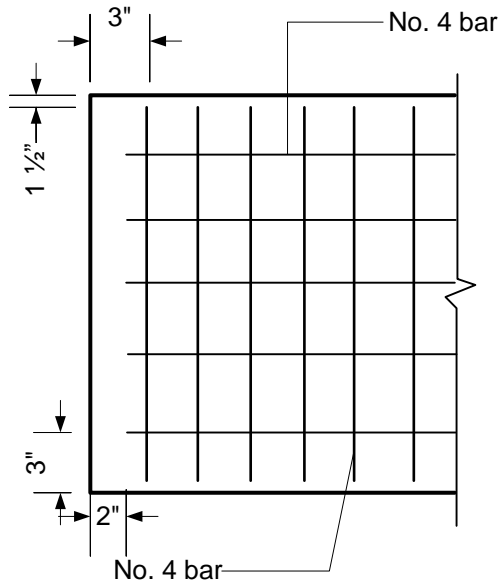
CIP slab reinforcement layout for box beam (Plan View)
